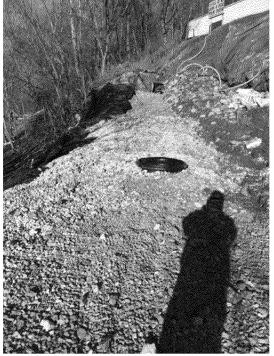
; Taken on 02/24/14 at 16:22 hours by START GN. Installed trench sump pipe.
